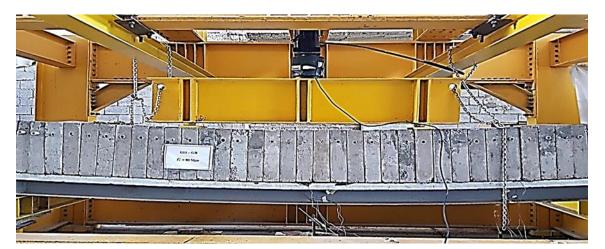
The Mode of Failure of the Steel Girder (GR1) G1
